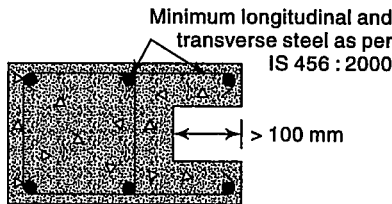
Reinforcement requirement for column with more than 100 mm projection beyond core
